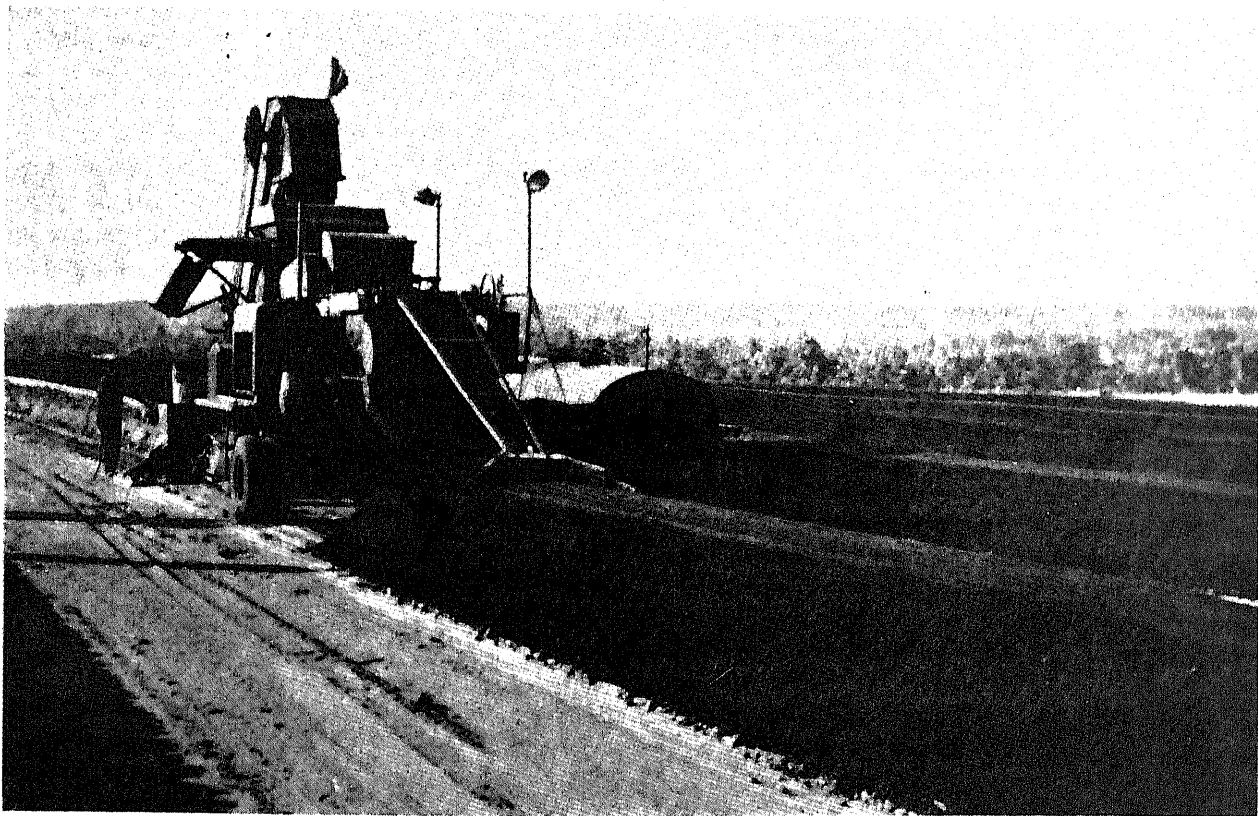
Typical travel plant mixing a road-mix pavement at an airfield site.
